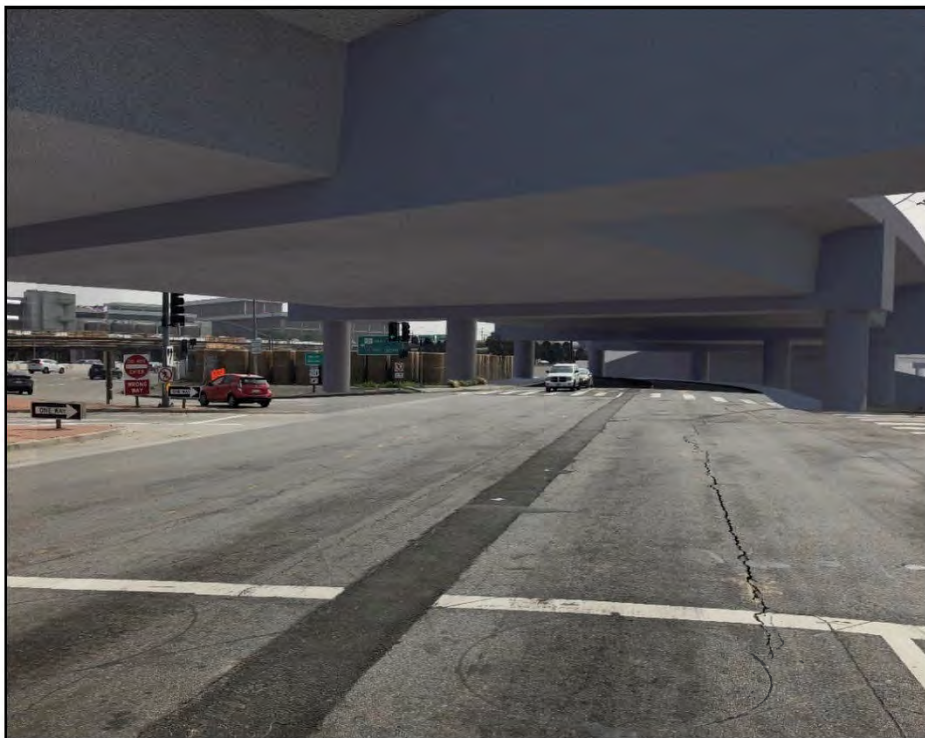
Key View #5b – Commercial Street (view looking north from Commercial Street toward US-101 and Los Angeles Union Station) Post-Project Conditions
